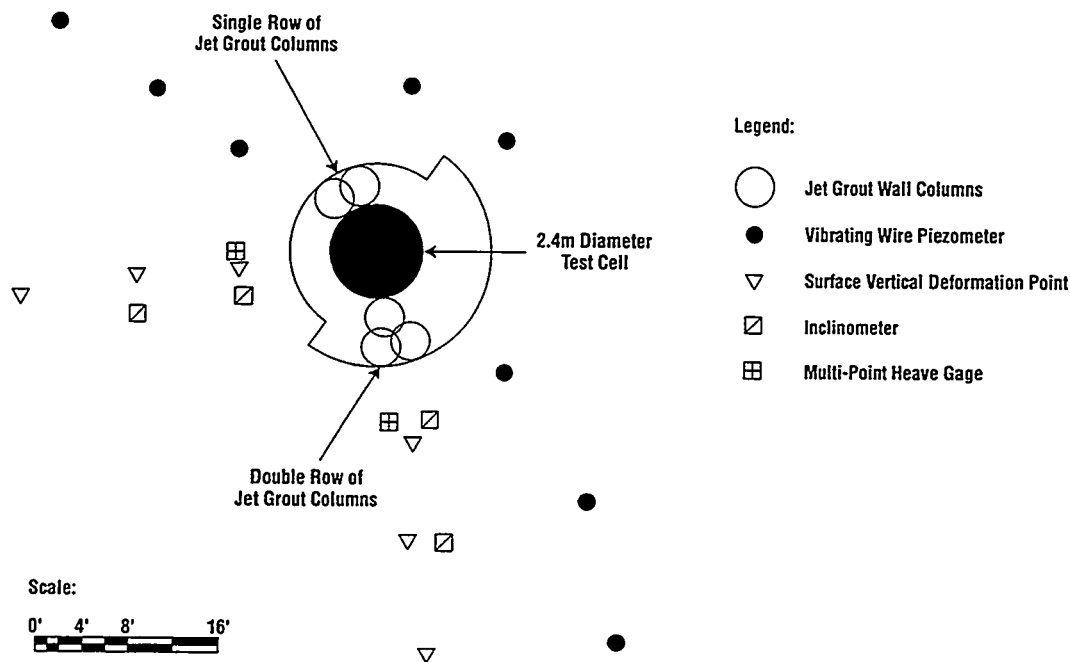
Jet Grout Test Cell and Instrumentation Layout Plan
